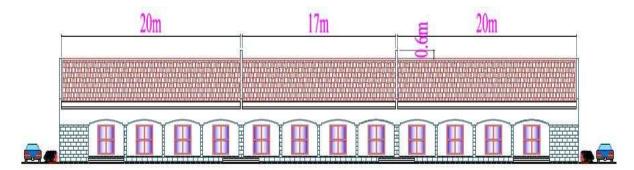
Proposed market shop building with 0.6 metre heights of the wall barriers at determined intervals along the horizontal length of the building.
